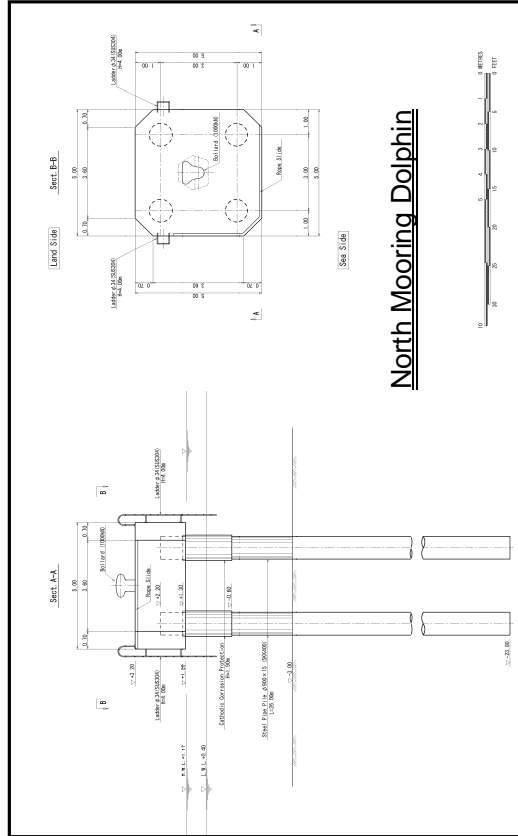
Plan and Front View of Mooring Dolphin
